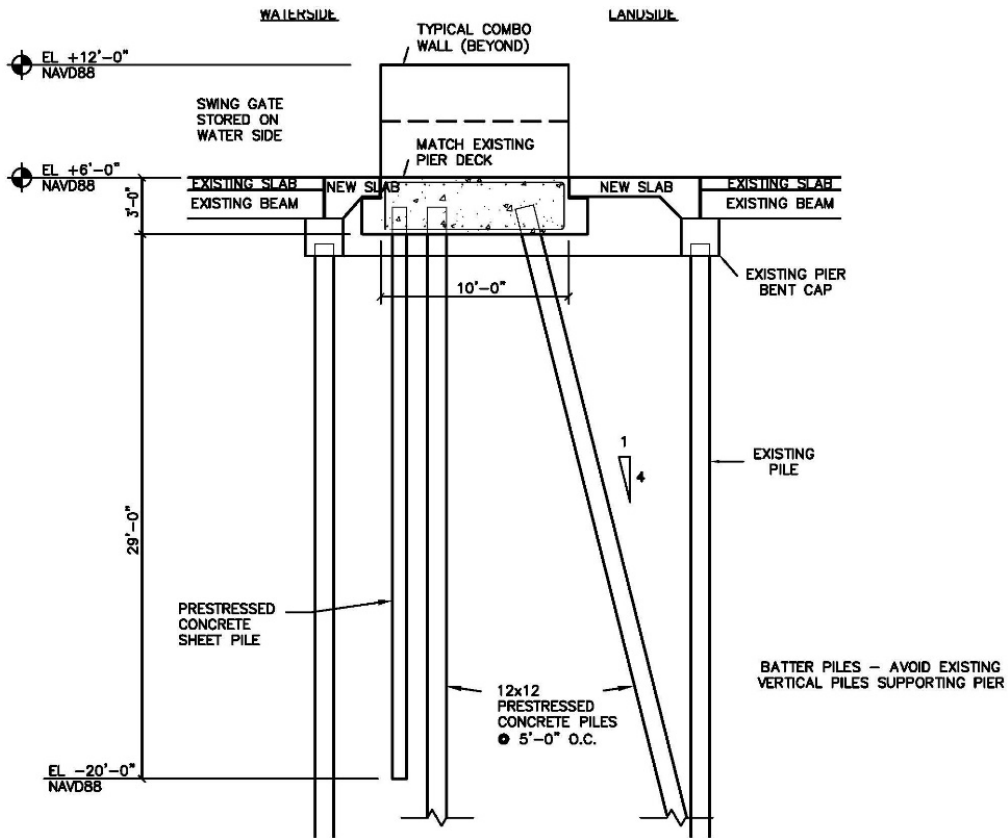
Typical section of Combo Wall Crossing Coast Guard Dock
